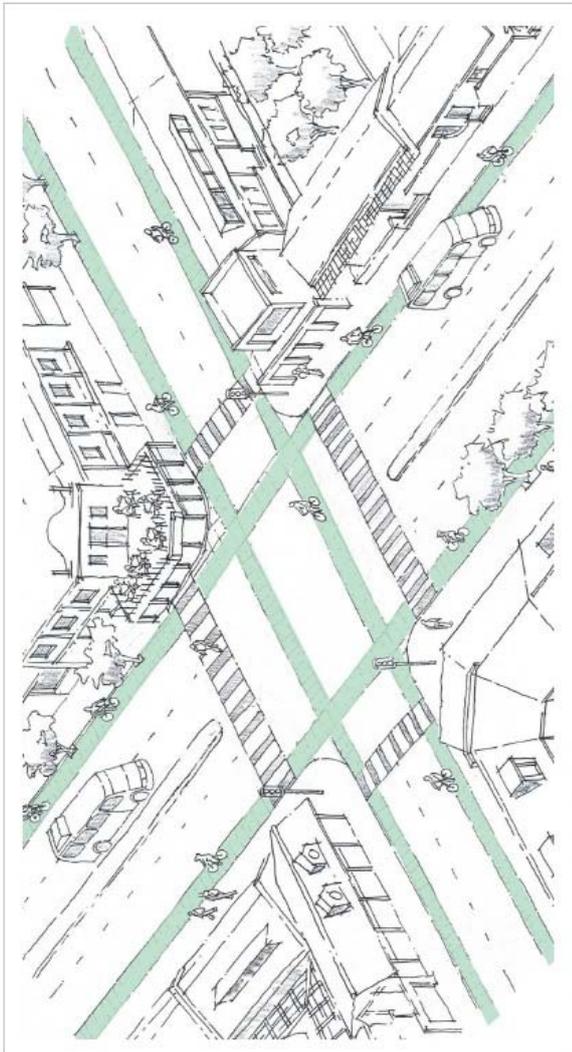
Street with Side Walk and Bike Path Intersection
